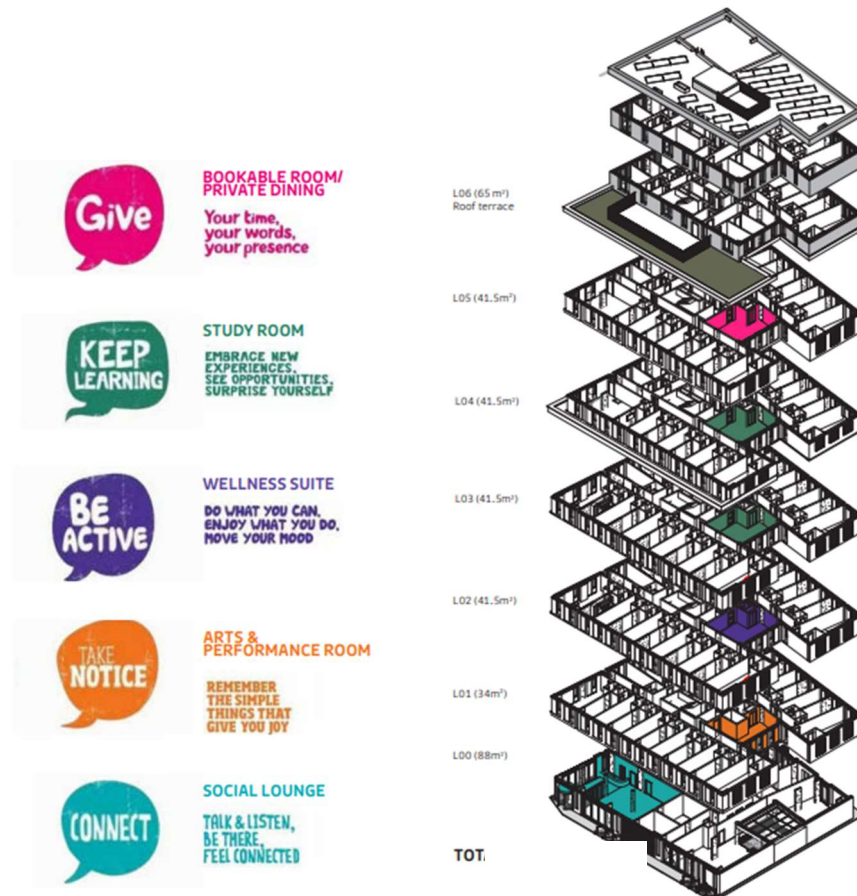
(above): Floorplans of the building where communal amenity facilities would be provided.
